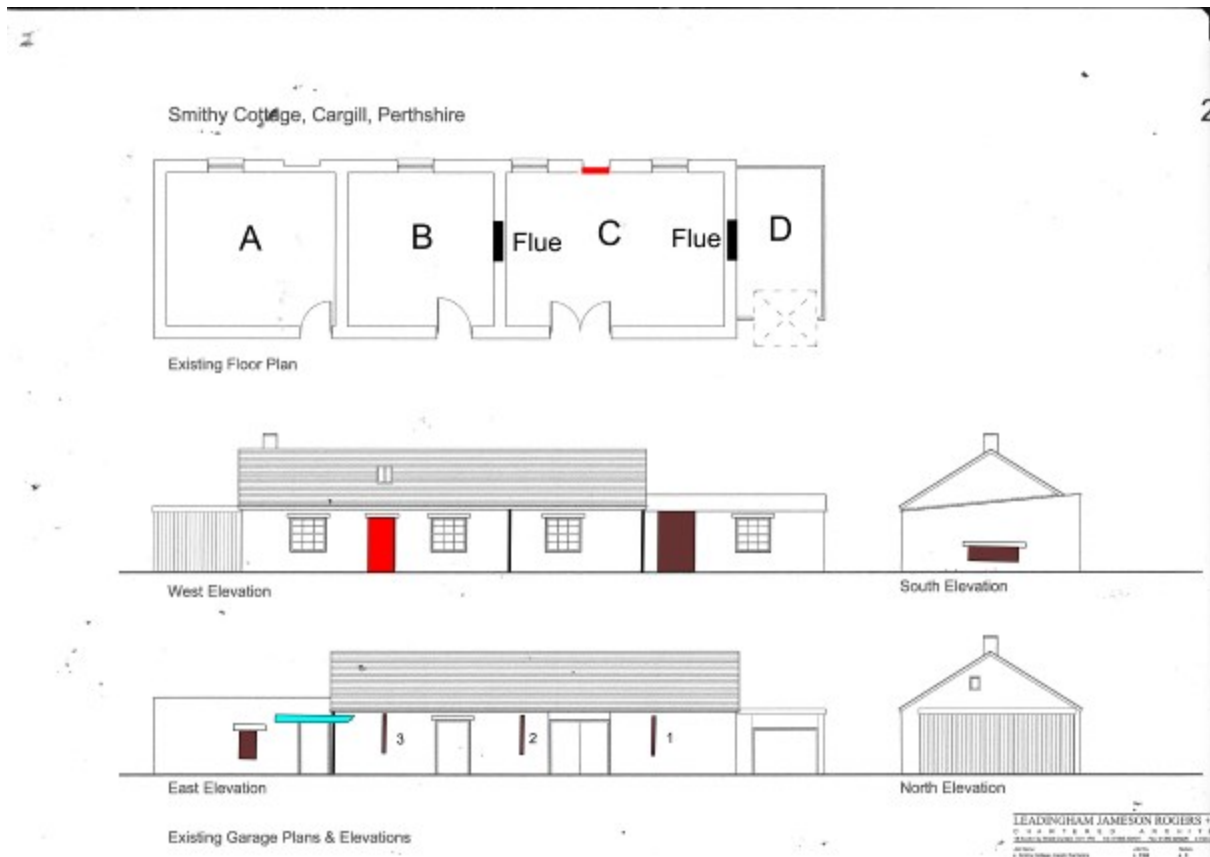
Building as recorded by survey, elevations marked with blocked doorways (red is brick brown is stone) and windows and visible straight joints (amended architects drawing). Light blue indicates a very long wooden lintel. Scale 1:100 at A3.
